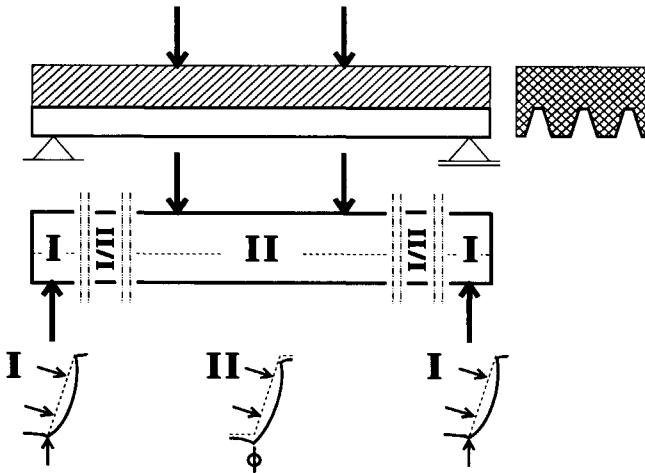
Limited applicability cross-sectional approach for full- and small-scale specimen
